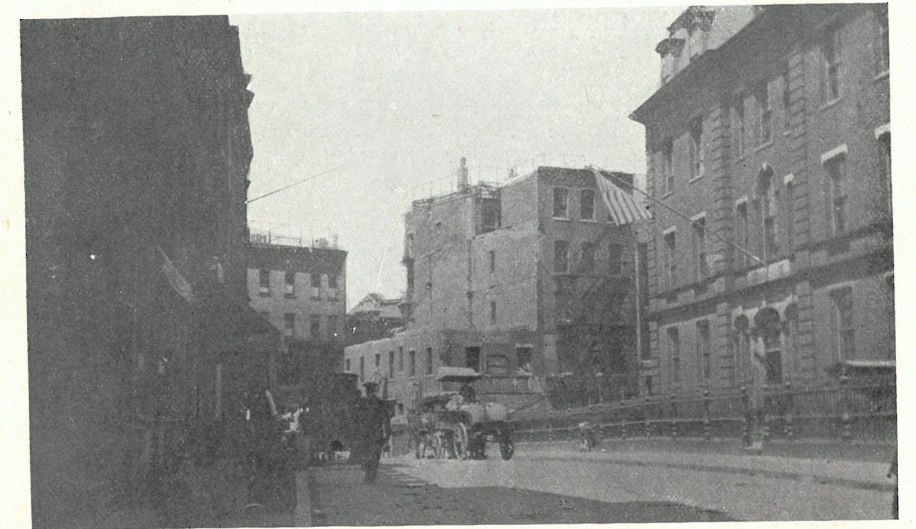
PARMENTER STREET, LOOKING WEST, SHOWING CUSHMAN SCHOOL-HOUSE AND CORNER OF SALEM STREET ON WHICH NEW BUILDING IS BEING ERECTED.
